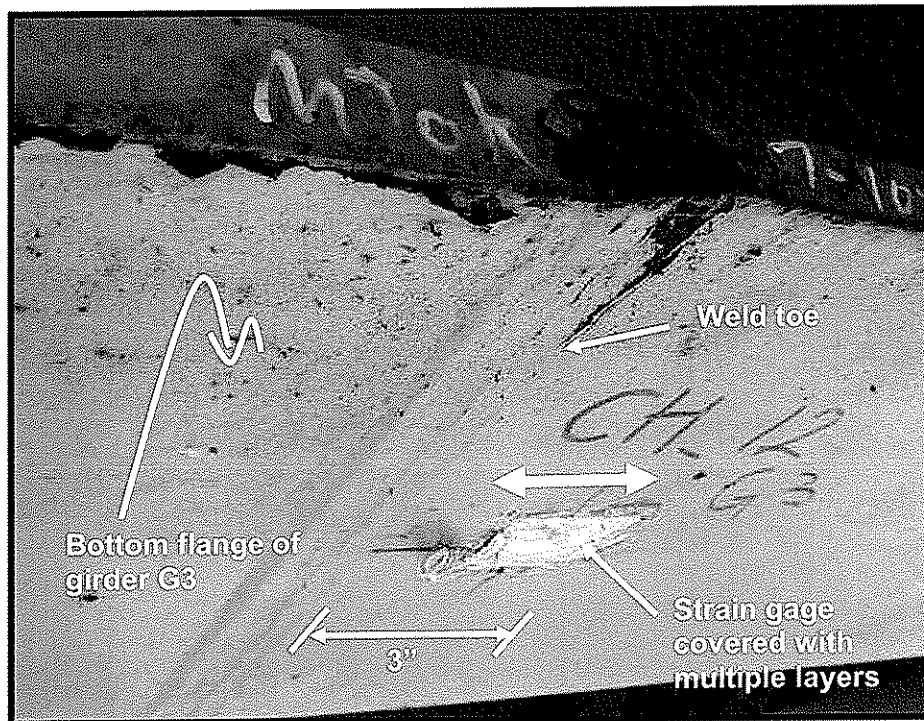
CH_12 installed in span 1 between P.P. 5 and P.P. 6 on the bottom face of the bottom flange of girder G3 (3 inches away from weld toe)
